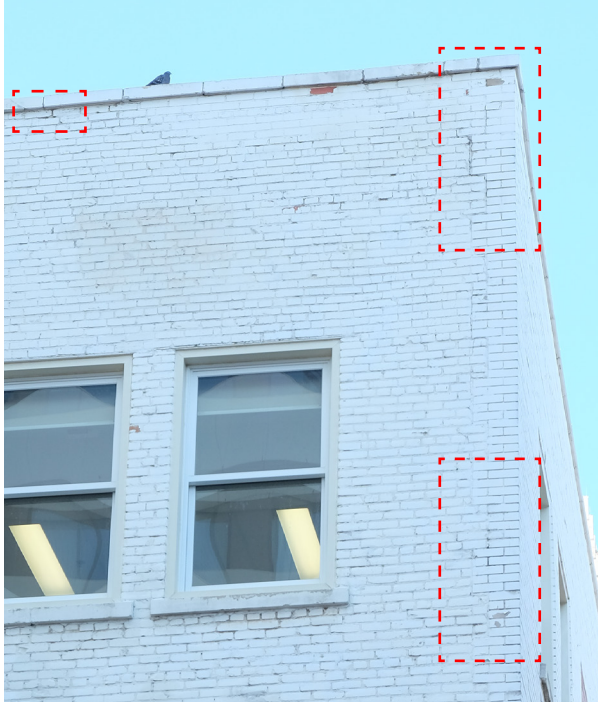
West terra cotta façade; outlining cracked and spalled terra cotta units
